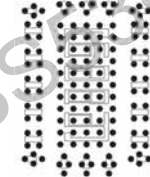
Pile and structure plan drawn by K. Buğra Taşçı ^[2]
